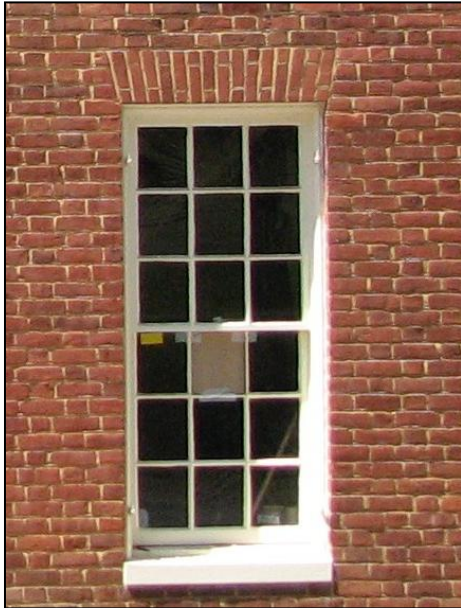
Typical brick jack arch on the Mahlon Schooley House on Second Street in the Waterford Historic District.
